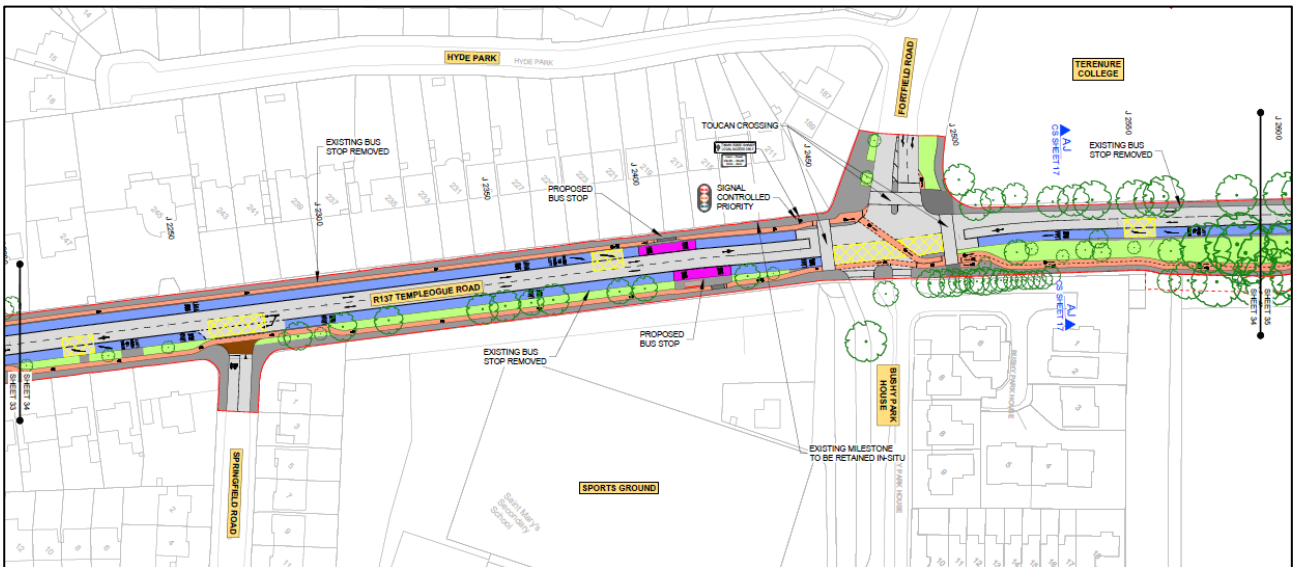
Extract from General Arrangement Drawings (Sheet 34)
